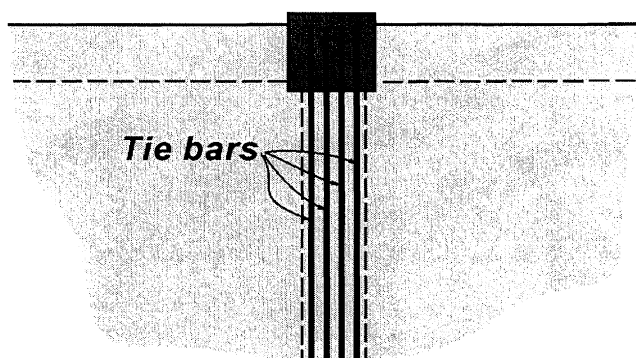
Alternate layout of reinforcement tie the column in to the topping slabs (Matthews, 2003b).
